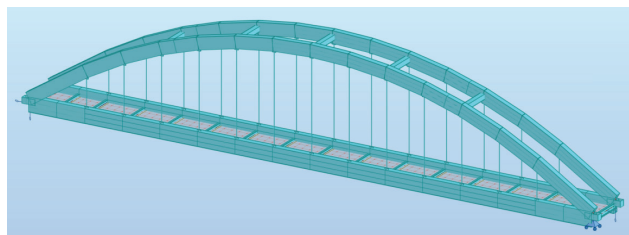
FEM model of the steel-concrete railway bridge of the Langer type
